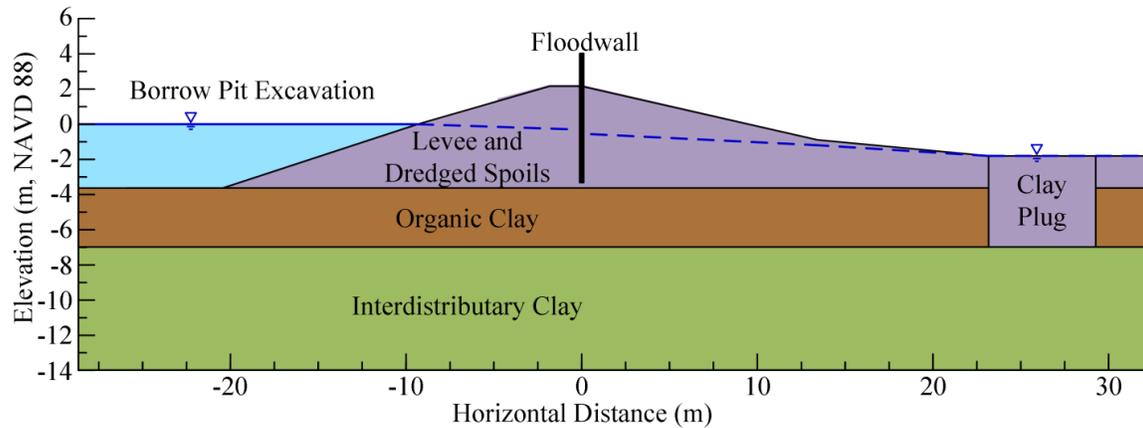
Floodwall cross-section through borrow pit used for parametric seepage analysis (after Stark et al. 2014)
